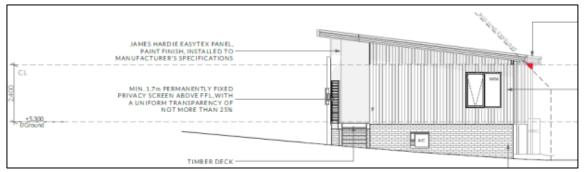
Western elevation for Unit 2 (area outside the building envelope highlighted in red)
